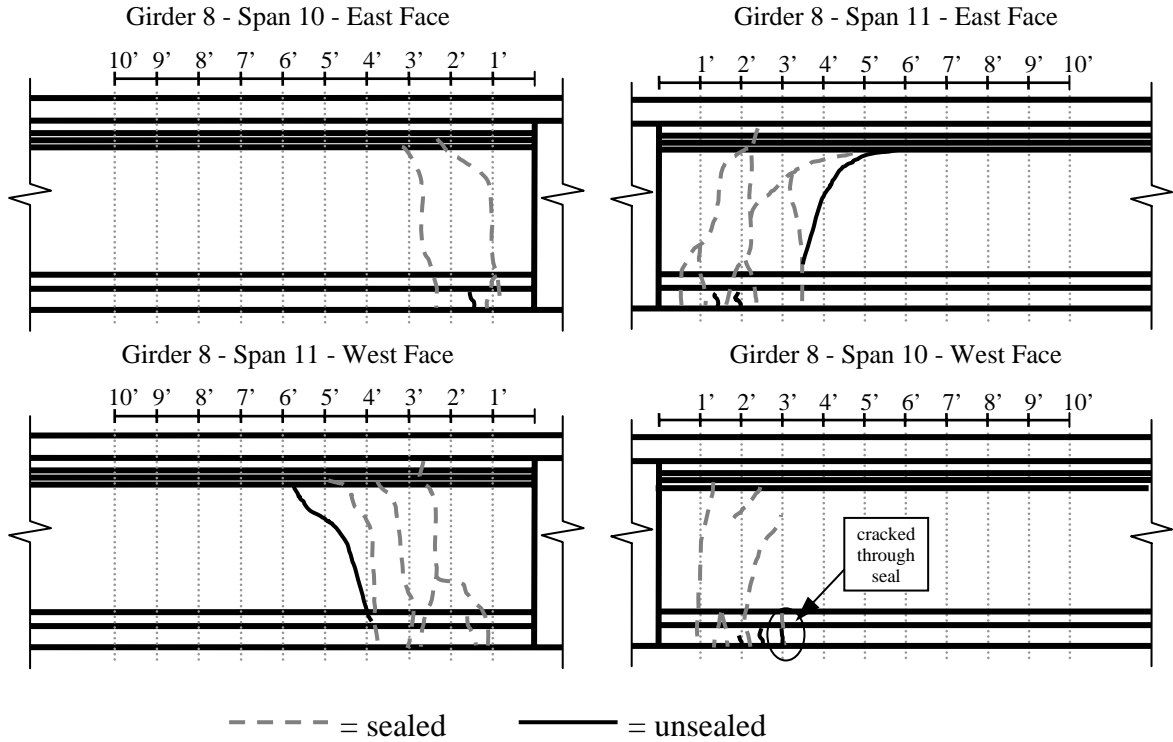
Girder Line 8 Cracking (Fason and Barnes 2004)
